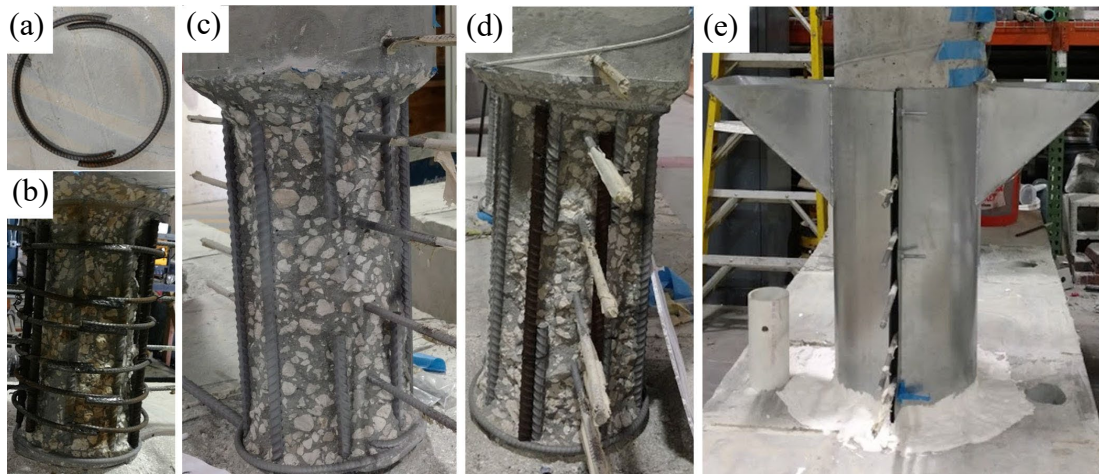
Repair process: (a) transverse reinforcement before placing in the damaged area; (b) transverse reinforcement placement in the damaged area; (c) specimens after cutting the rebar; (d) specimens after placing the spliced rebar; and (e) formwork used to place UHPC (Farzad et al., 2019)
